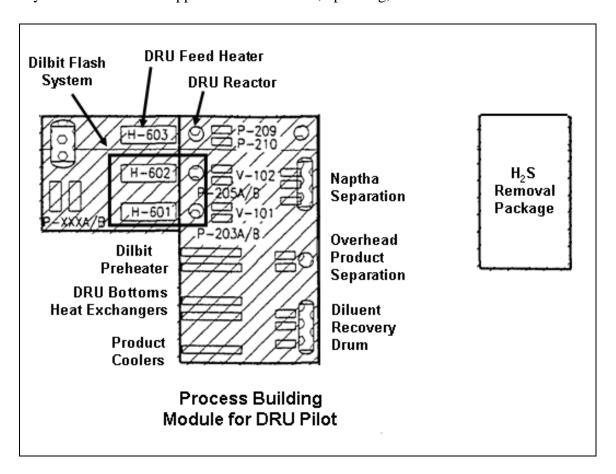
Planned equipment layout for DRU pilot at MEG's production facility.
